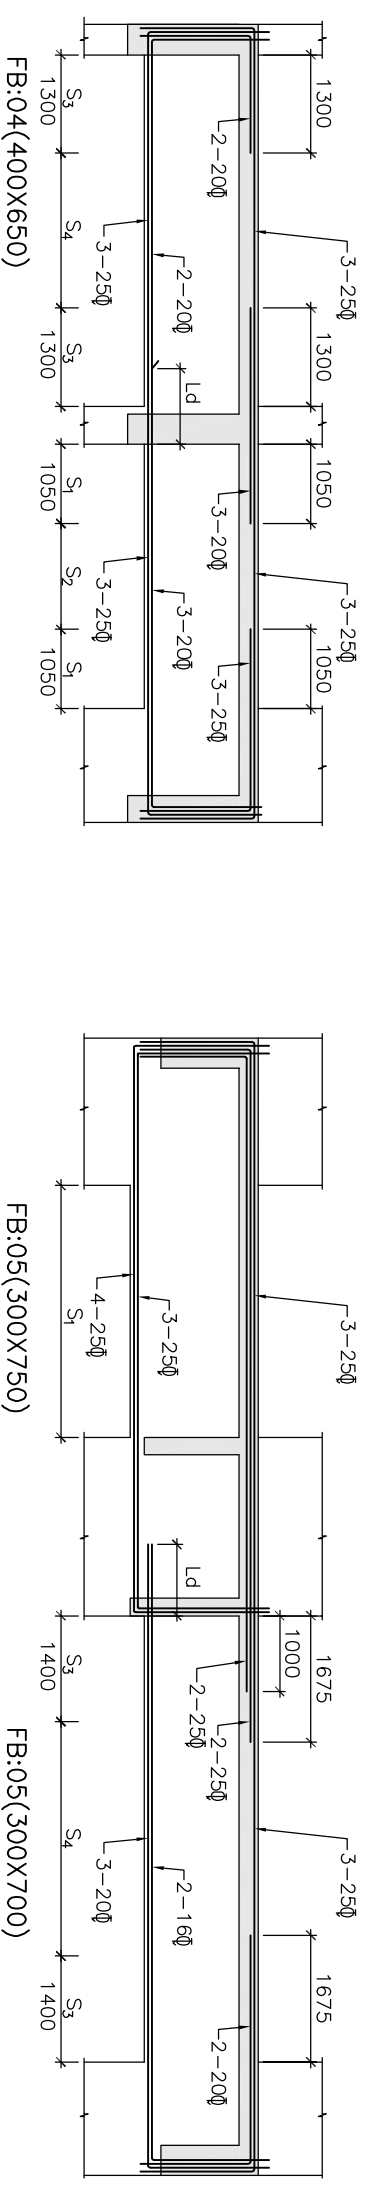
DETAILS OF THIRD FLOOR BEAM LAYOUT (SHEET 1 / 2)
